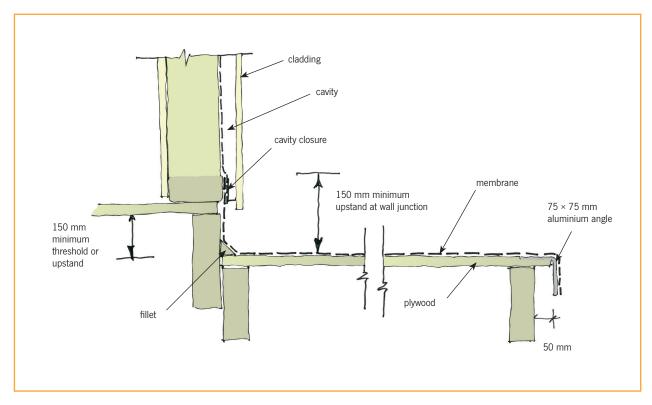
Deck-to-wall cladding junction. Corner fillets and chamfers reduce risk of wrinkles at changes of direction.
